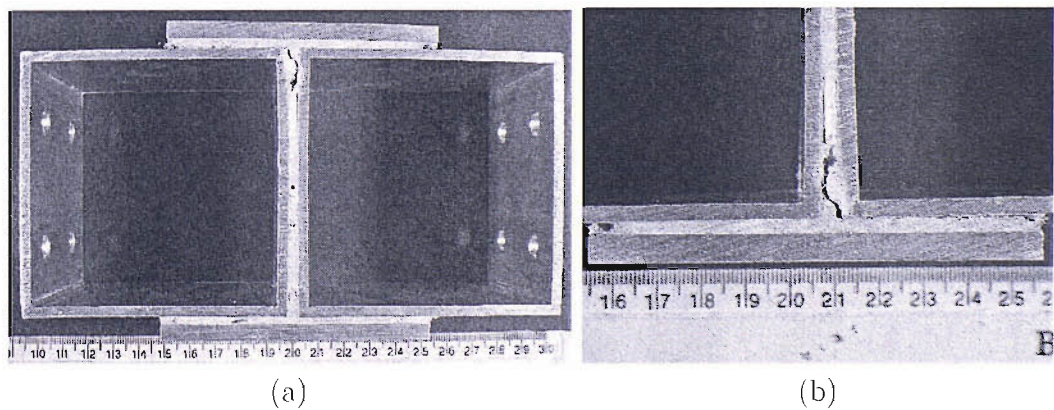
Typical Failure in aluminium to aluminium connection in tension.
